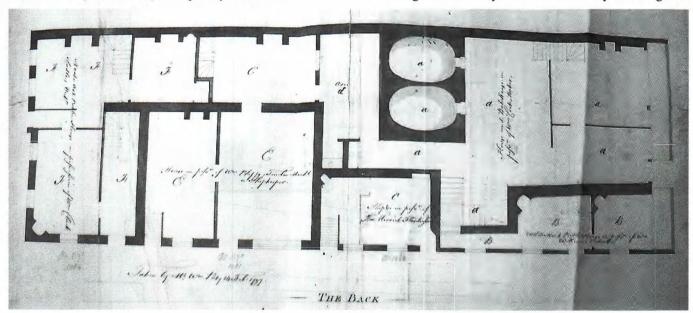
Ground floor plan of Nos. 1 & 2 King Street, dated 14th February, 1797.
